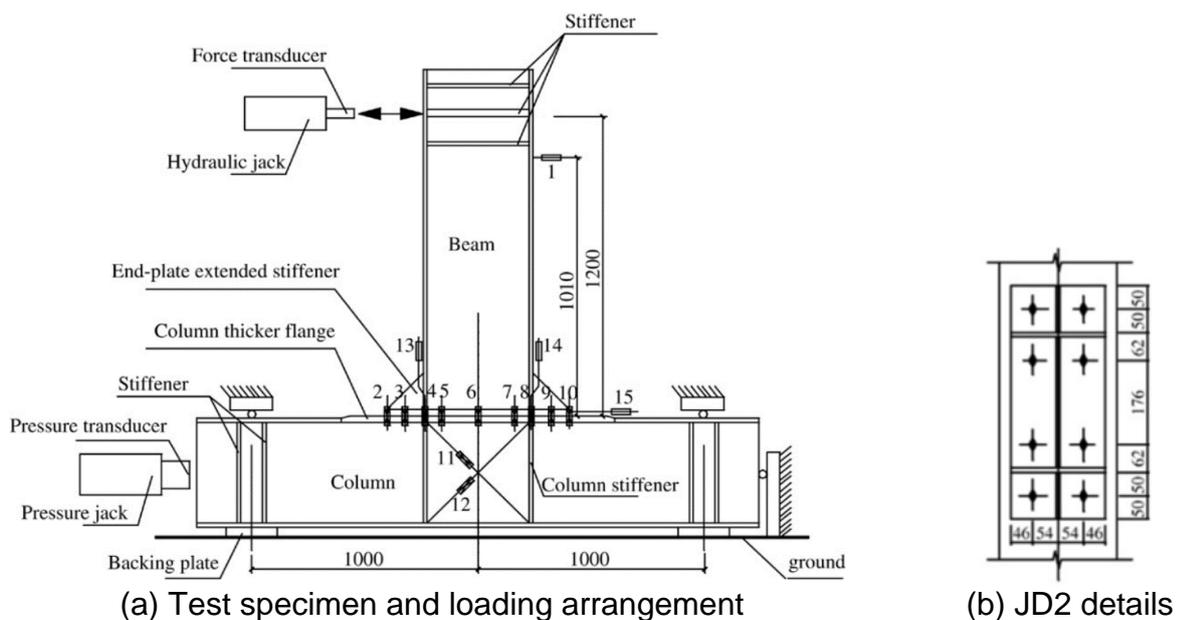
Test specimen, loading arrangement and connection details (Shi 2007).
